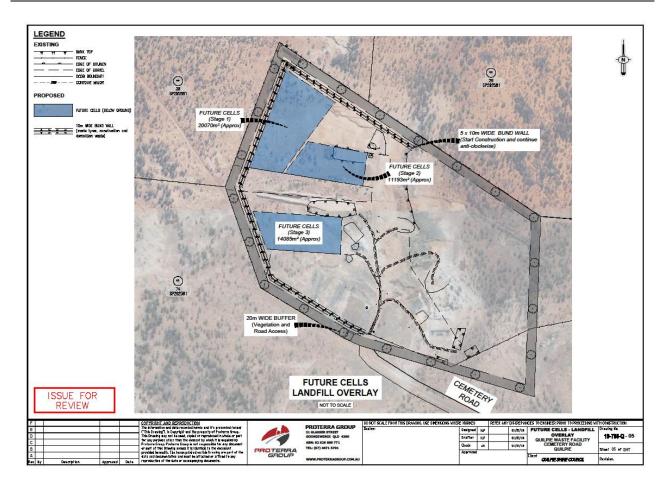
Quilpie Waste Facility – Proposed Future Landfilling Areas
